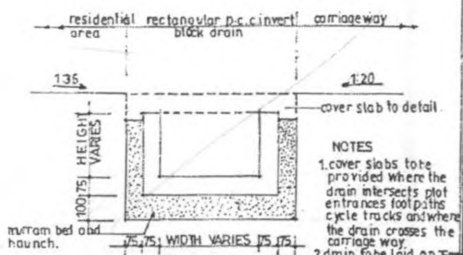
DETAIL OF CROSSING OF FOOTPATH CYCLE TRACK AND ROAD
